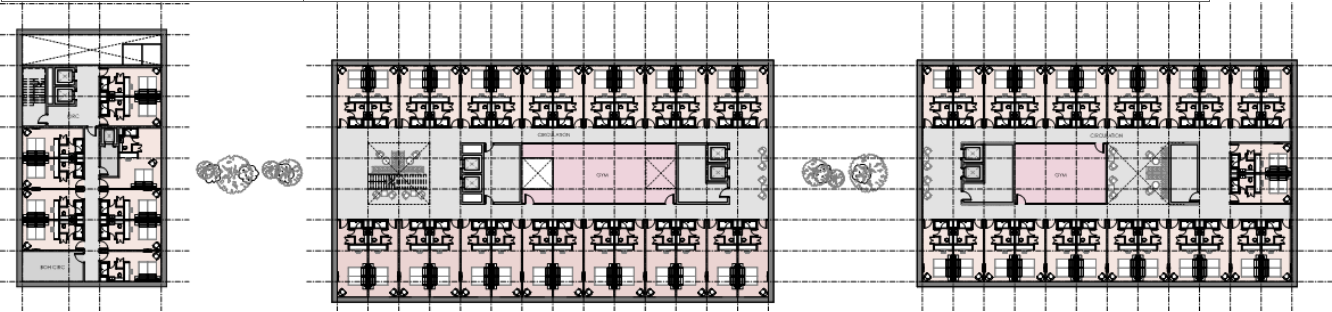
Plot 8 - Typical hotel bedroom upper floor plan.
